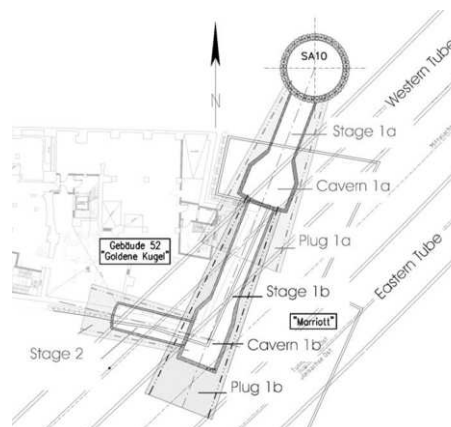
Plan view of the freezing stages (Kirsch and Richer)
